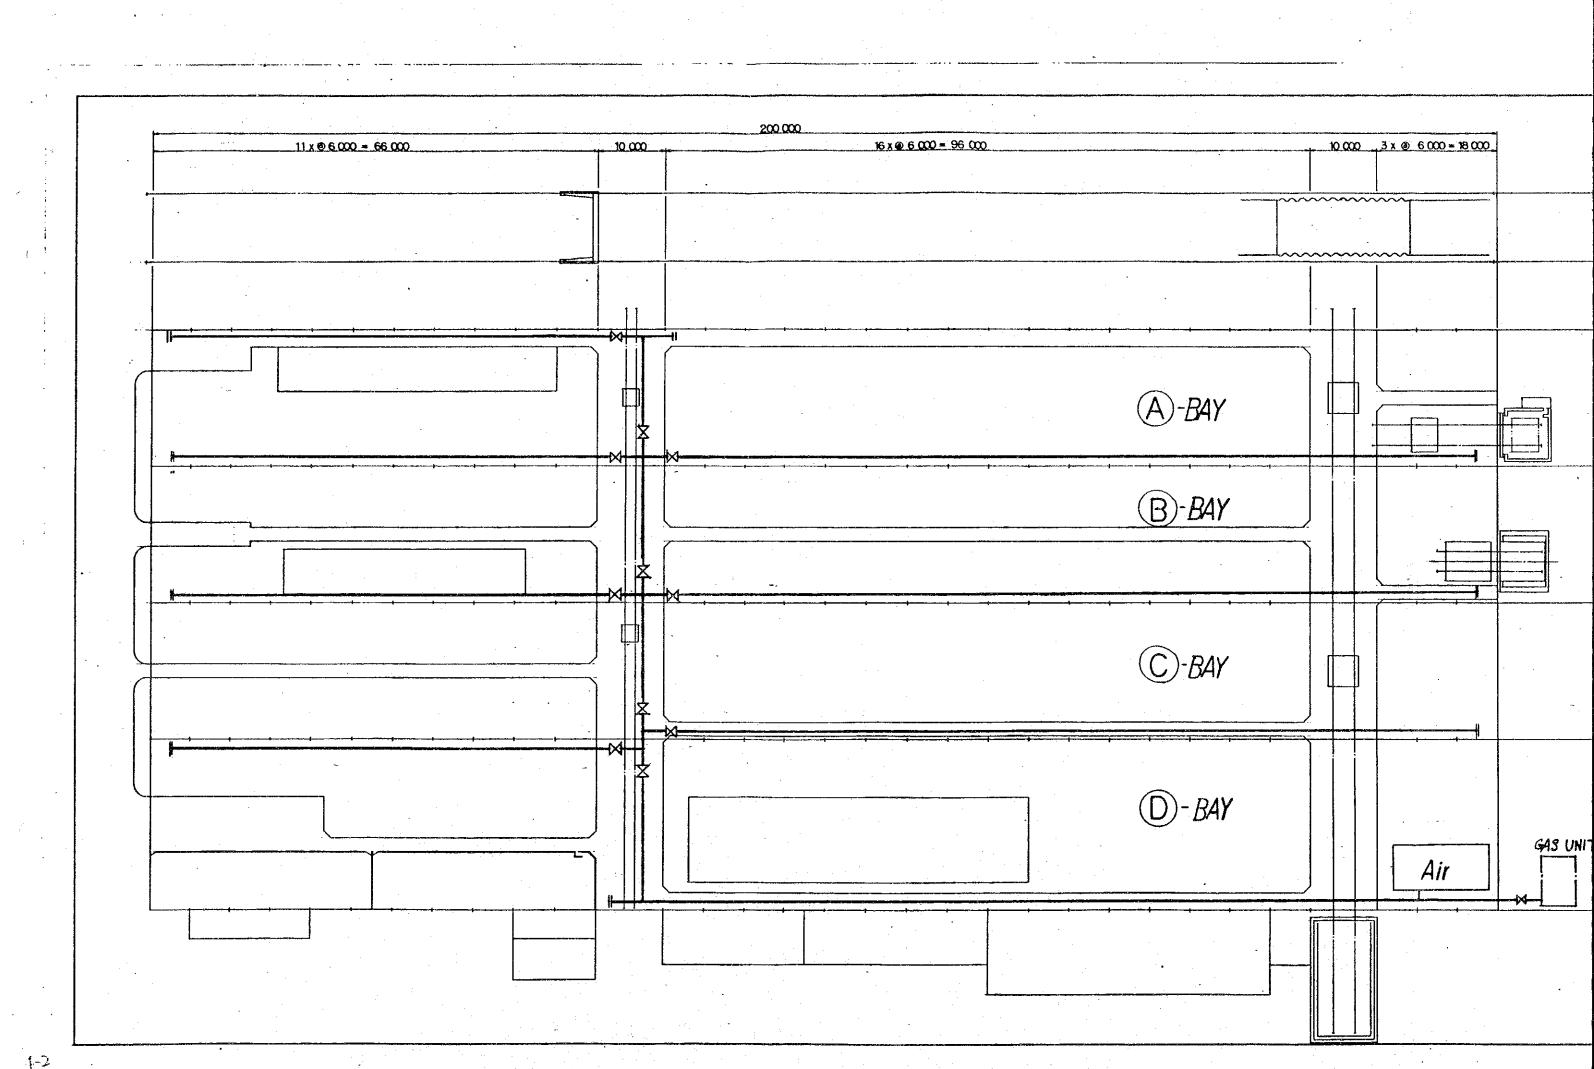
LAYOUT_PLAN (GRESIK)
